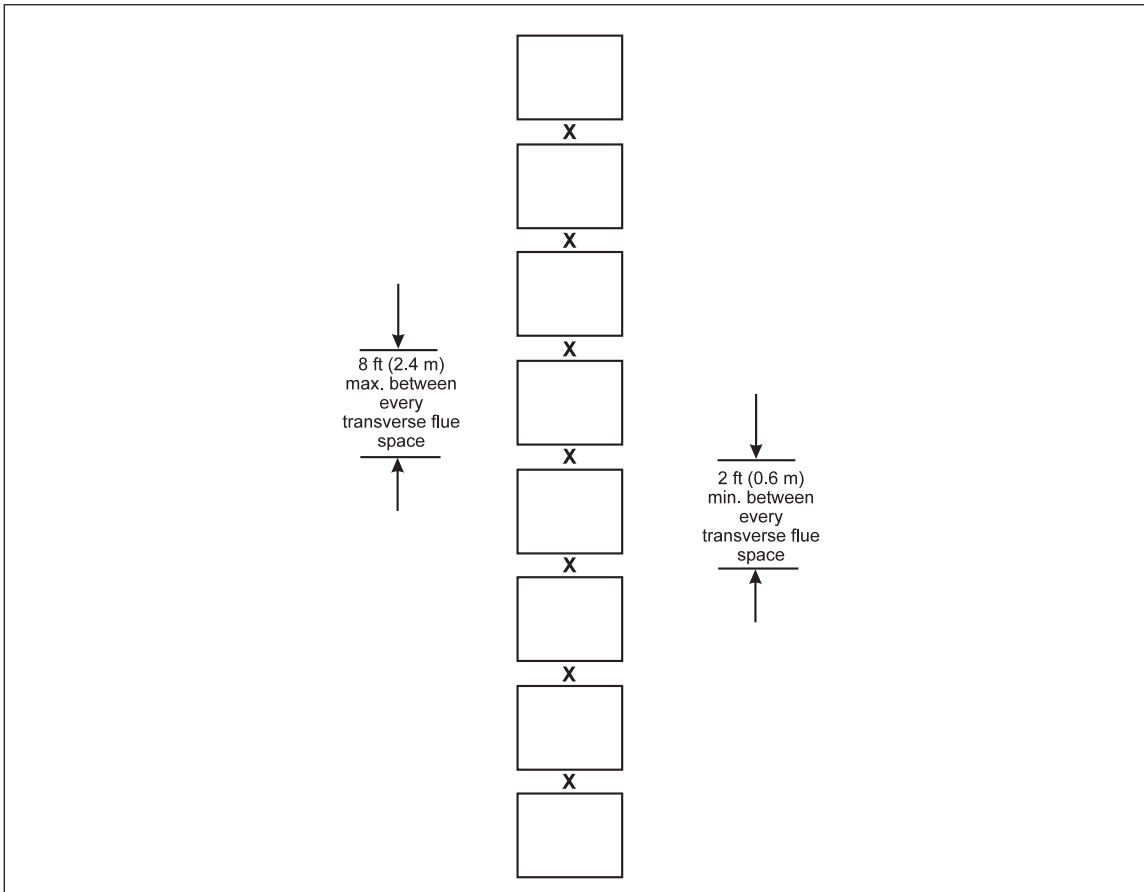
Plan view of IRAS(E) in-rack sprinkler arrangement for single-row racks
